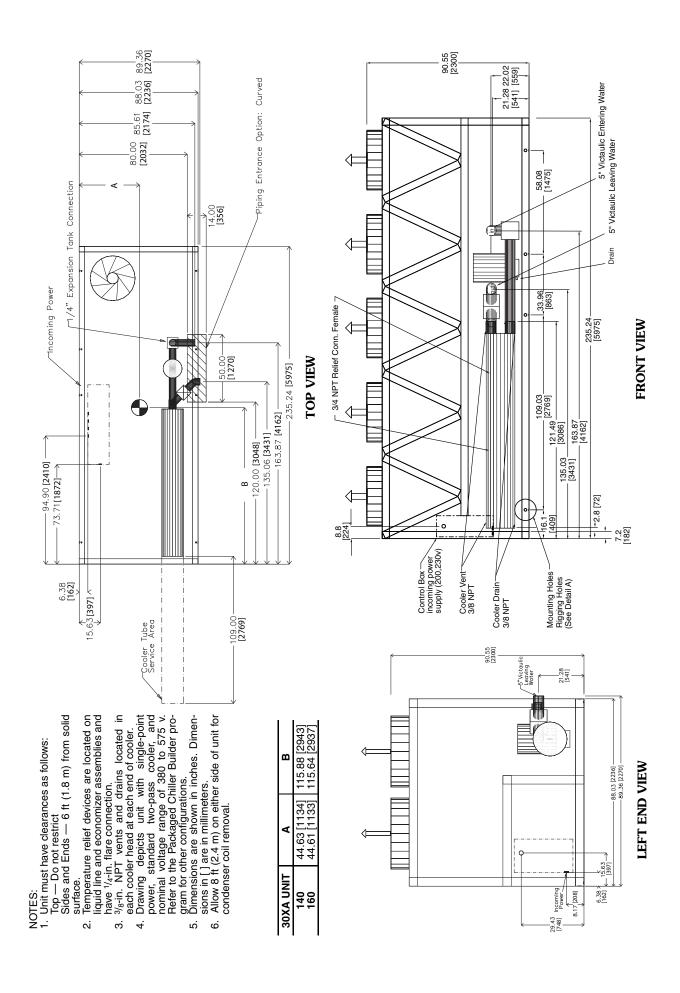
30XA140,160 Air-Cooled Liquid Chiller with Pump Dimensions
